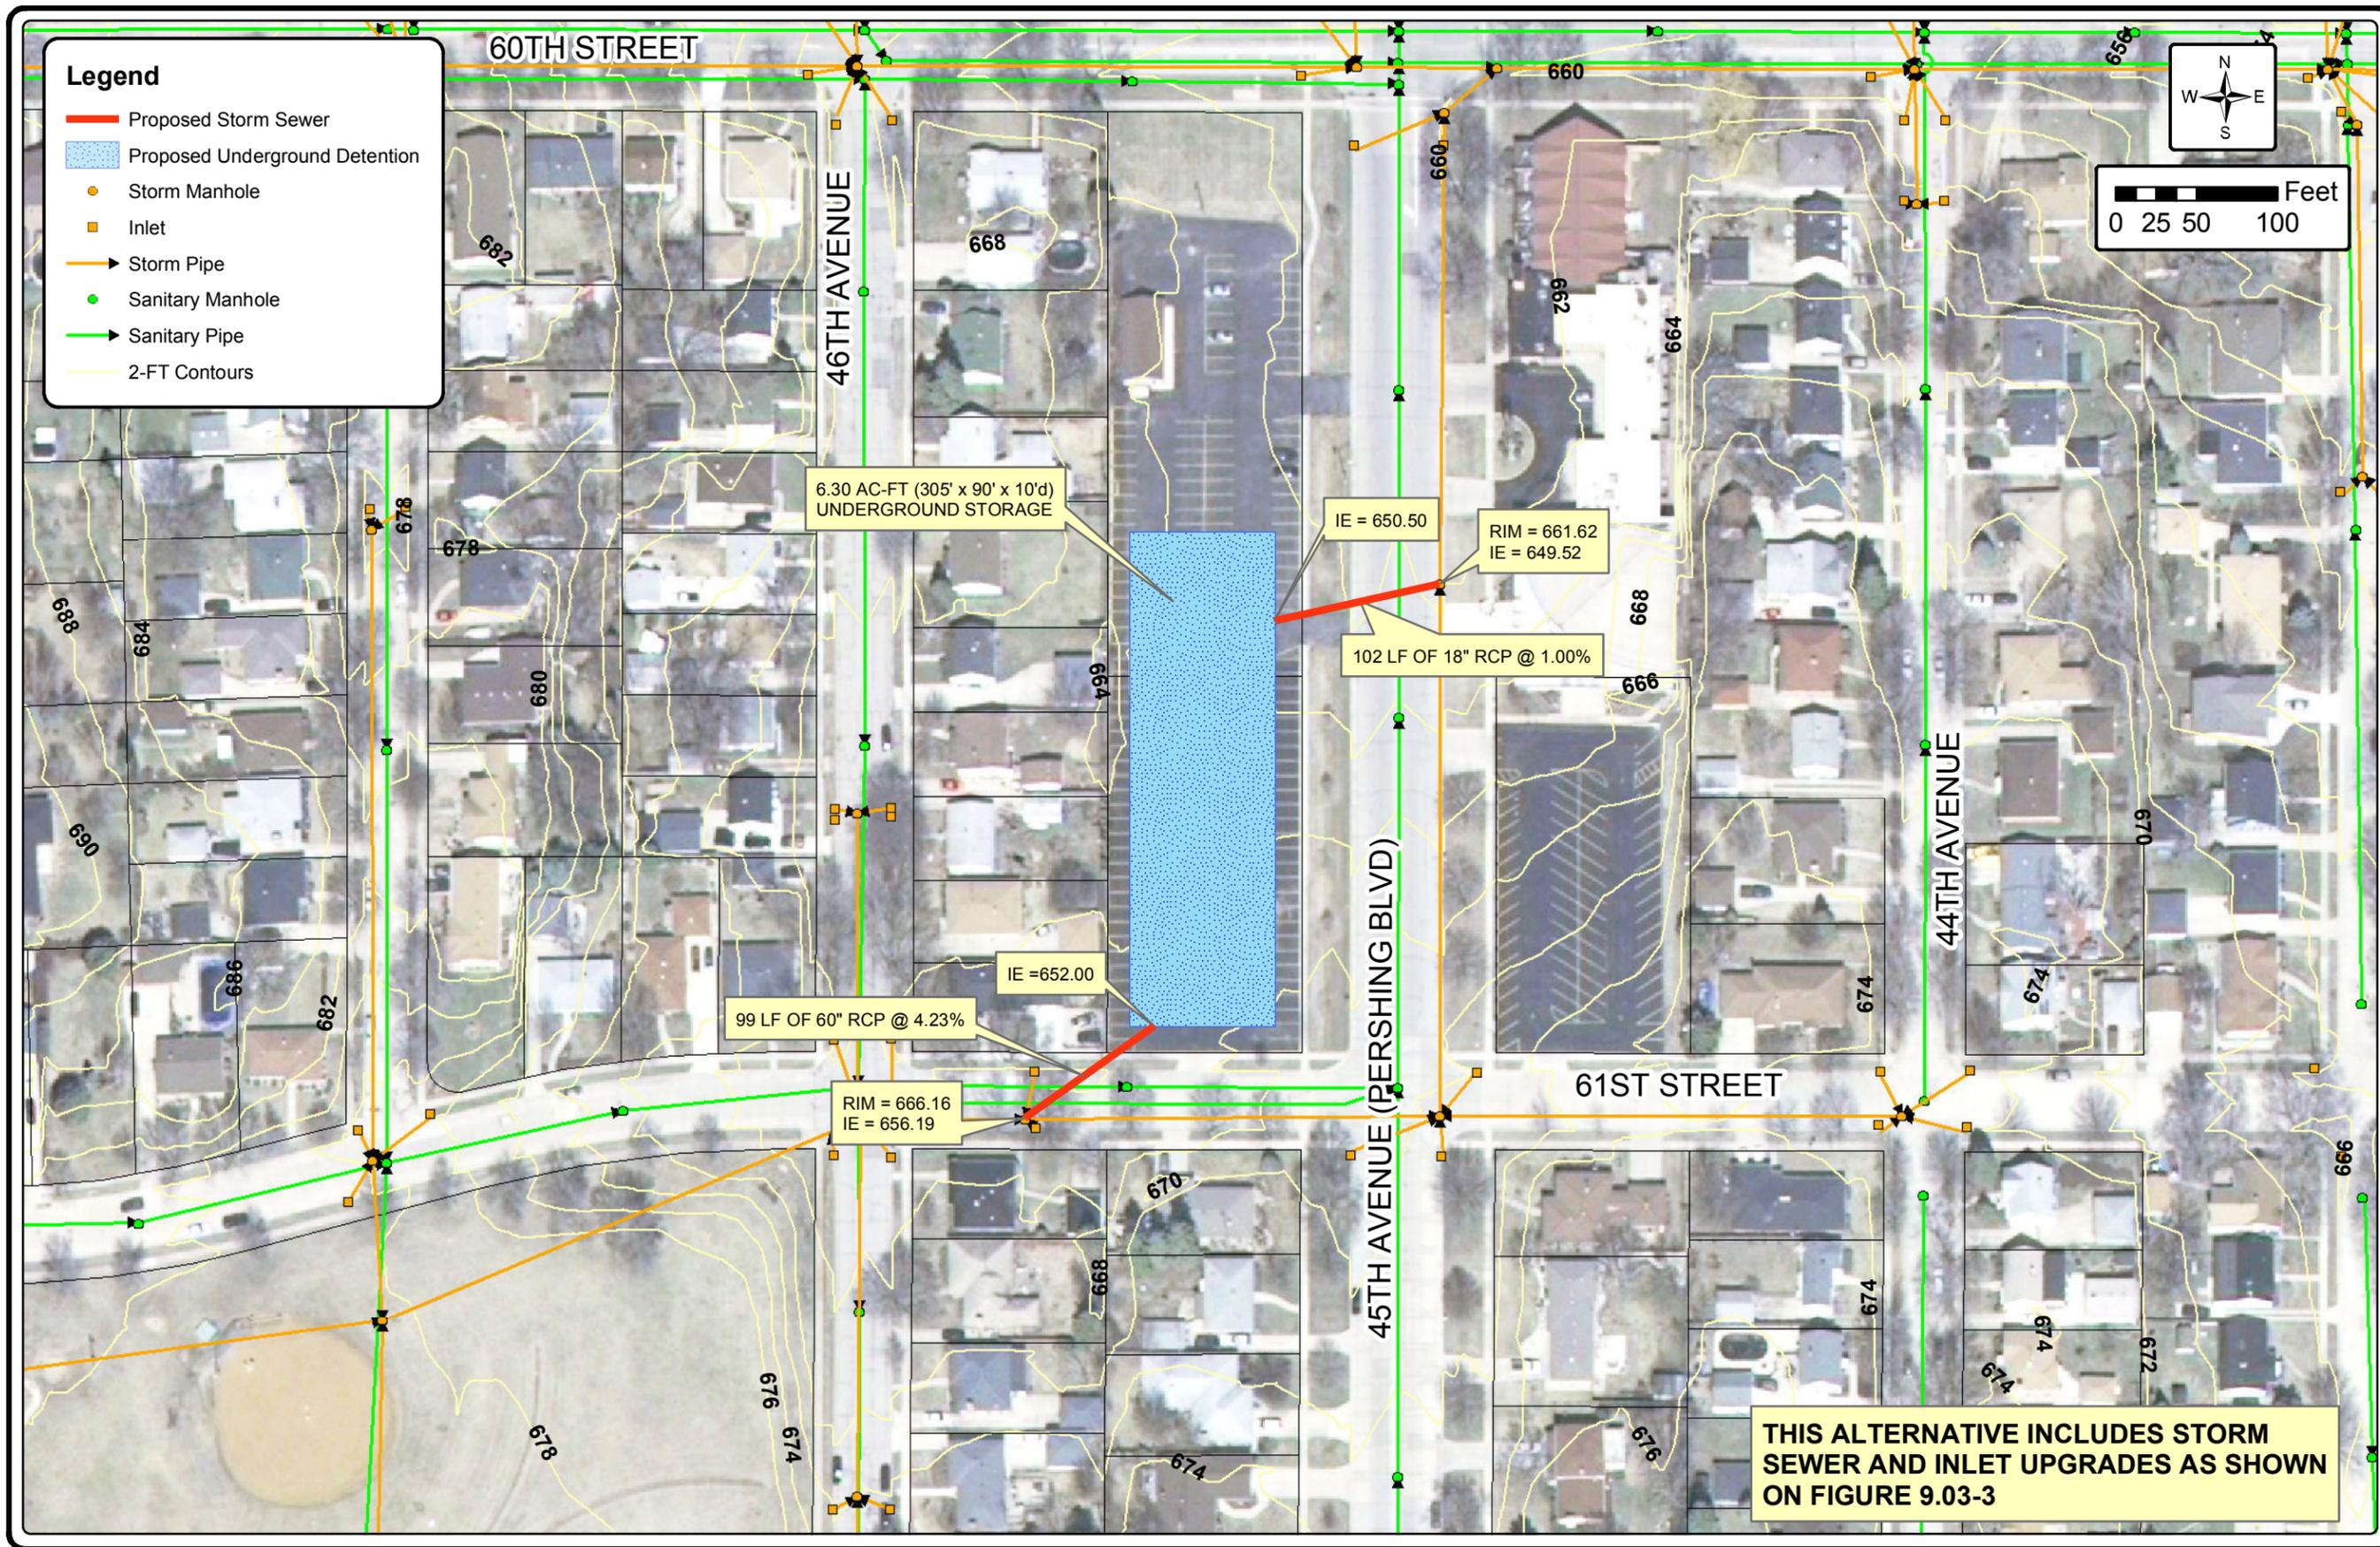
Alternative 3–Immanuel Baptist Church Parking Lot Northwest from Pershing Boulevard/61st Street Intersection
